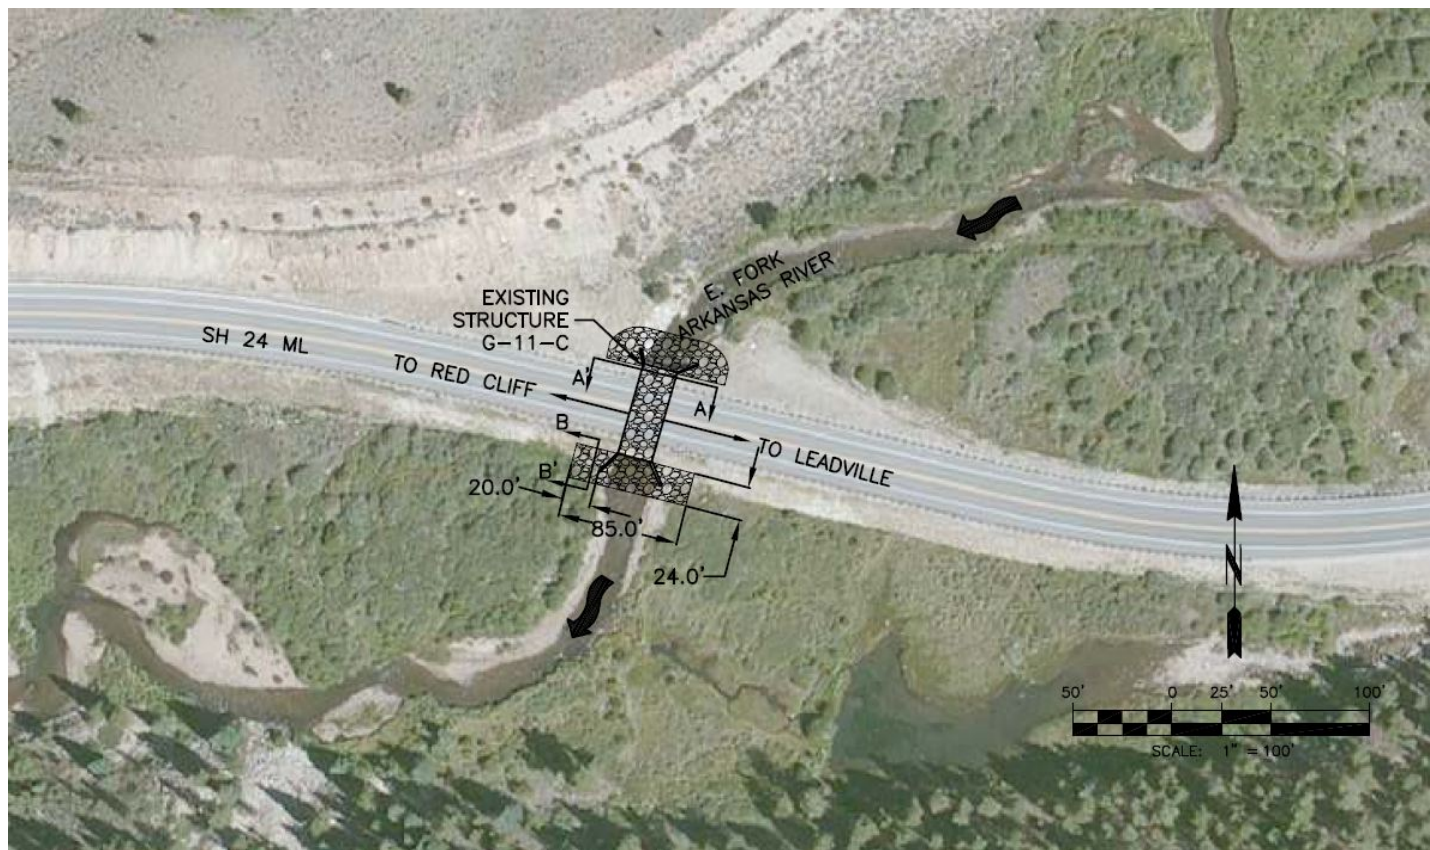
Plan view of Bridge G-11-C with recommended hydraulic scour countermeasure locations
